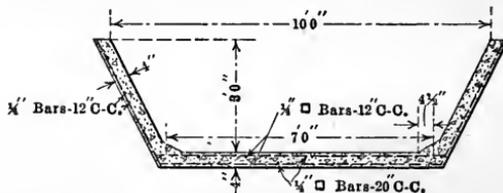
Reinforced concrete lining. Yakima Valley Canal, Wash.
